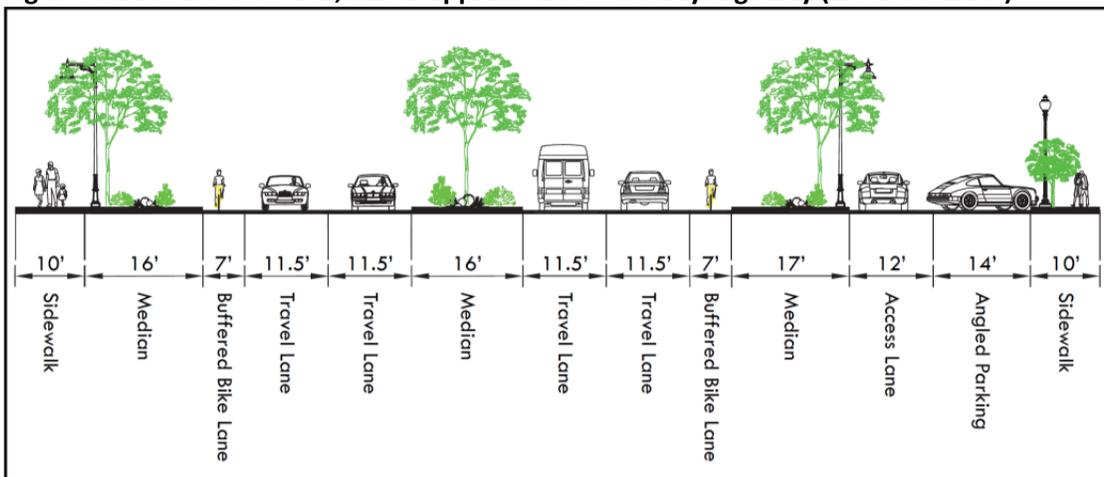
East Cross-Section, Mississippi Avenue to McVay Highway (155 Feet Wide)
